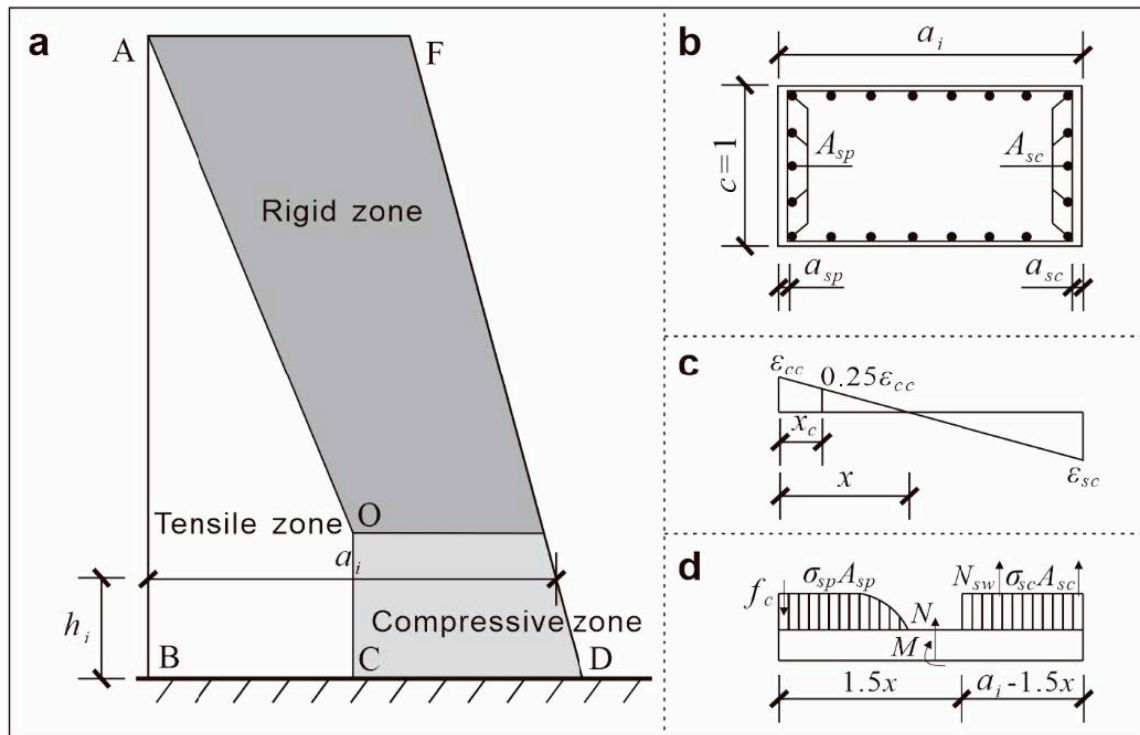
Ultimate stress states of a retaining wall section. ((a) deformed zones and section location; (b) diagram showing the section; (c) stress distribution on the section; (d) bearing capacity of the section).
